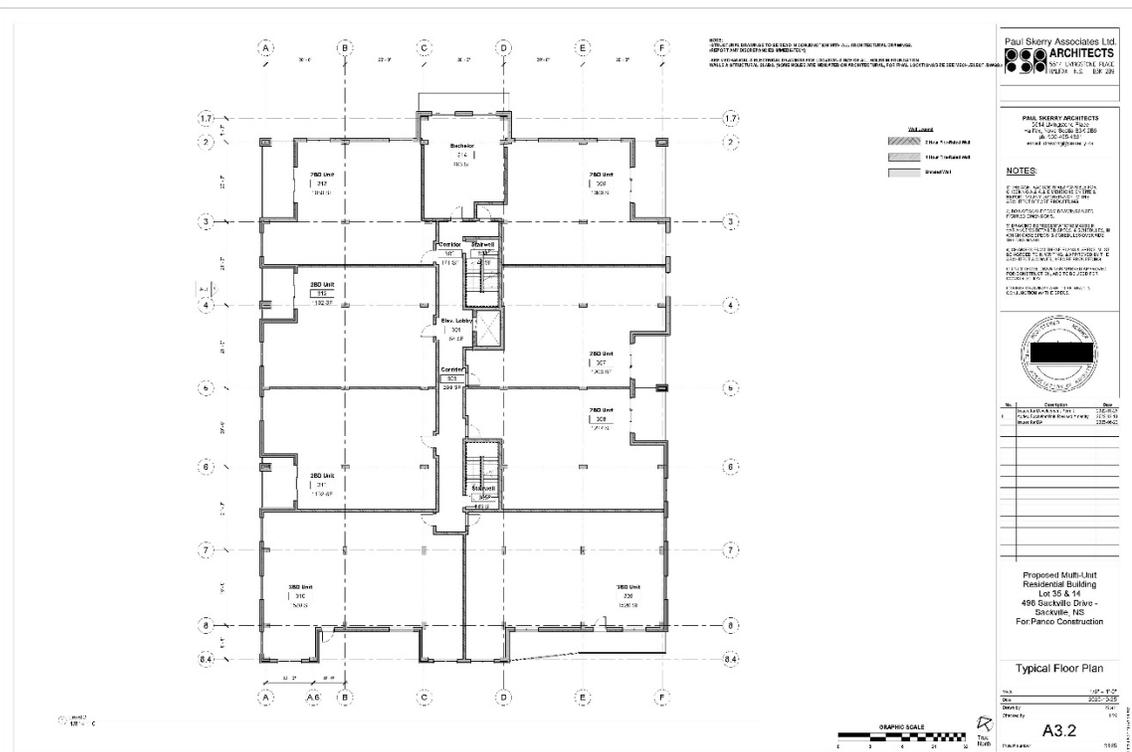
Typical Floor Plan at 498 Sackville Drive
